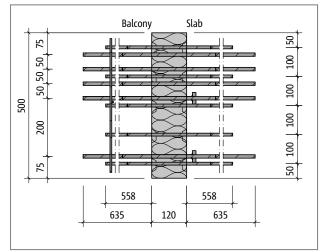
Schöck Isokorb® XT type C-L-M1-V1: Product plan view
